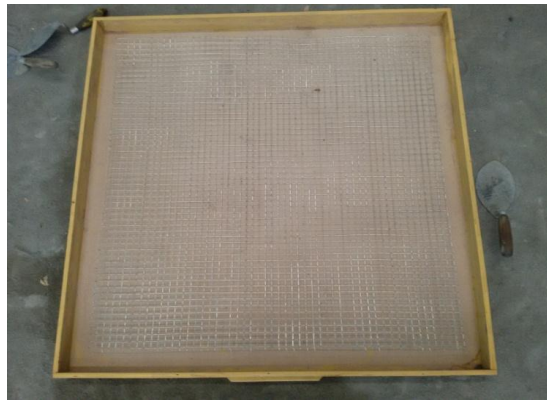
Pieces of welded square mesh (spacing 20\*20mm, 1.2mm diameter)
